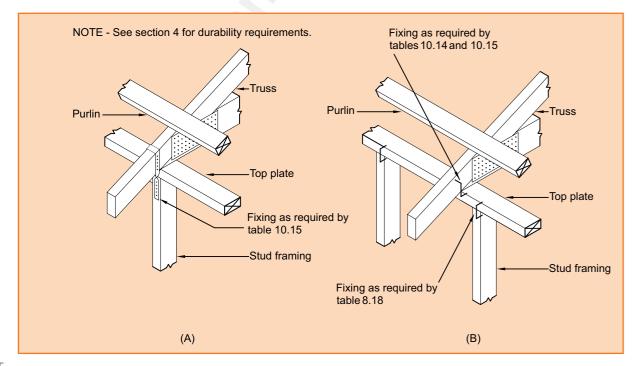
Truss/top plate connections (see 10.2.2.6)
